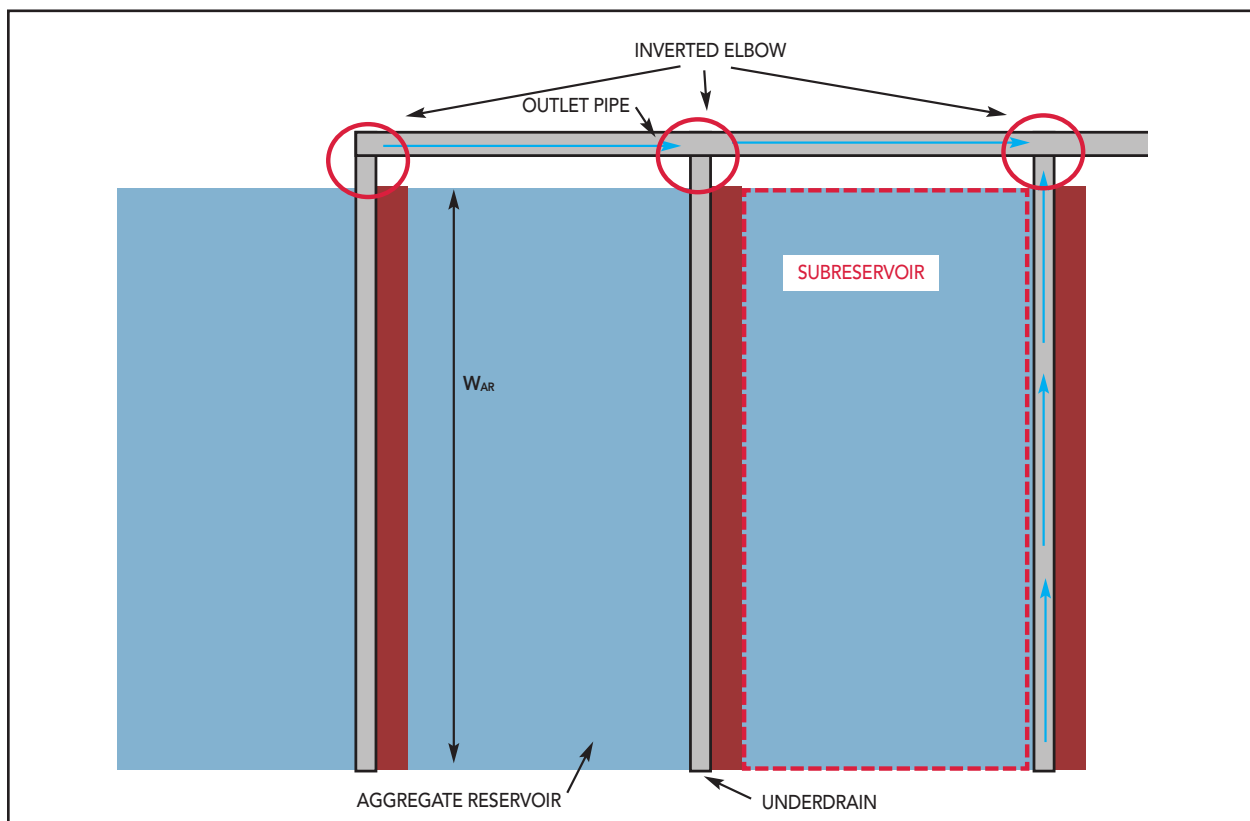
Plan View of a Sloped Permeable Pavement System
